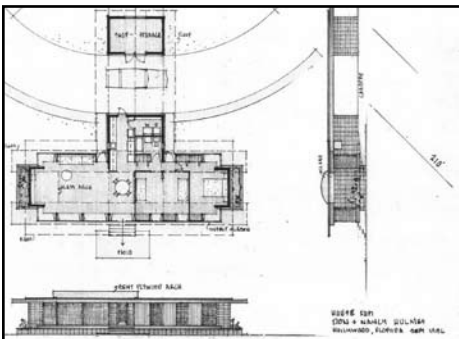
Floor plan of Hulmes House (built 1956) illustrating diagonal orientation of house to its site [Charles Reed, Jr. collection]
